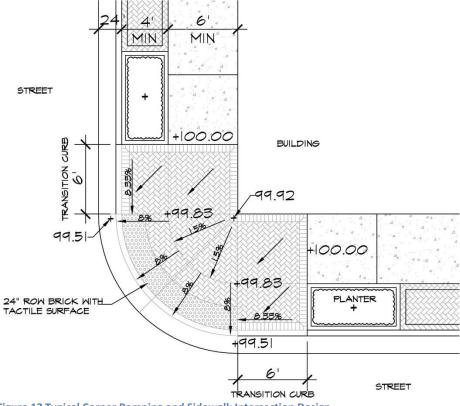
Typical Corner Ramping and Sidewalk Intersection Design
